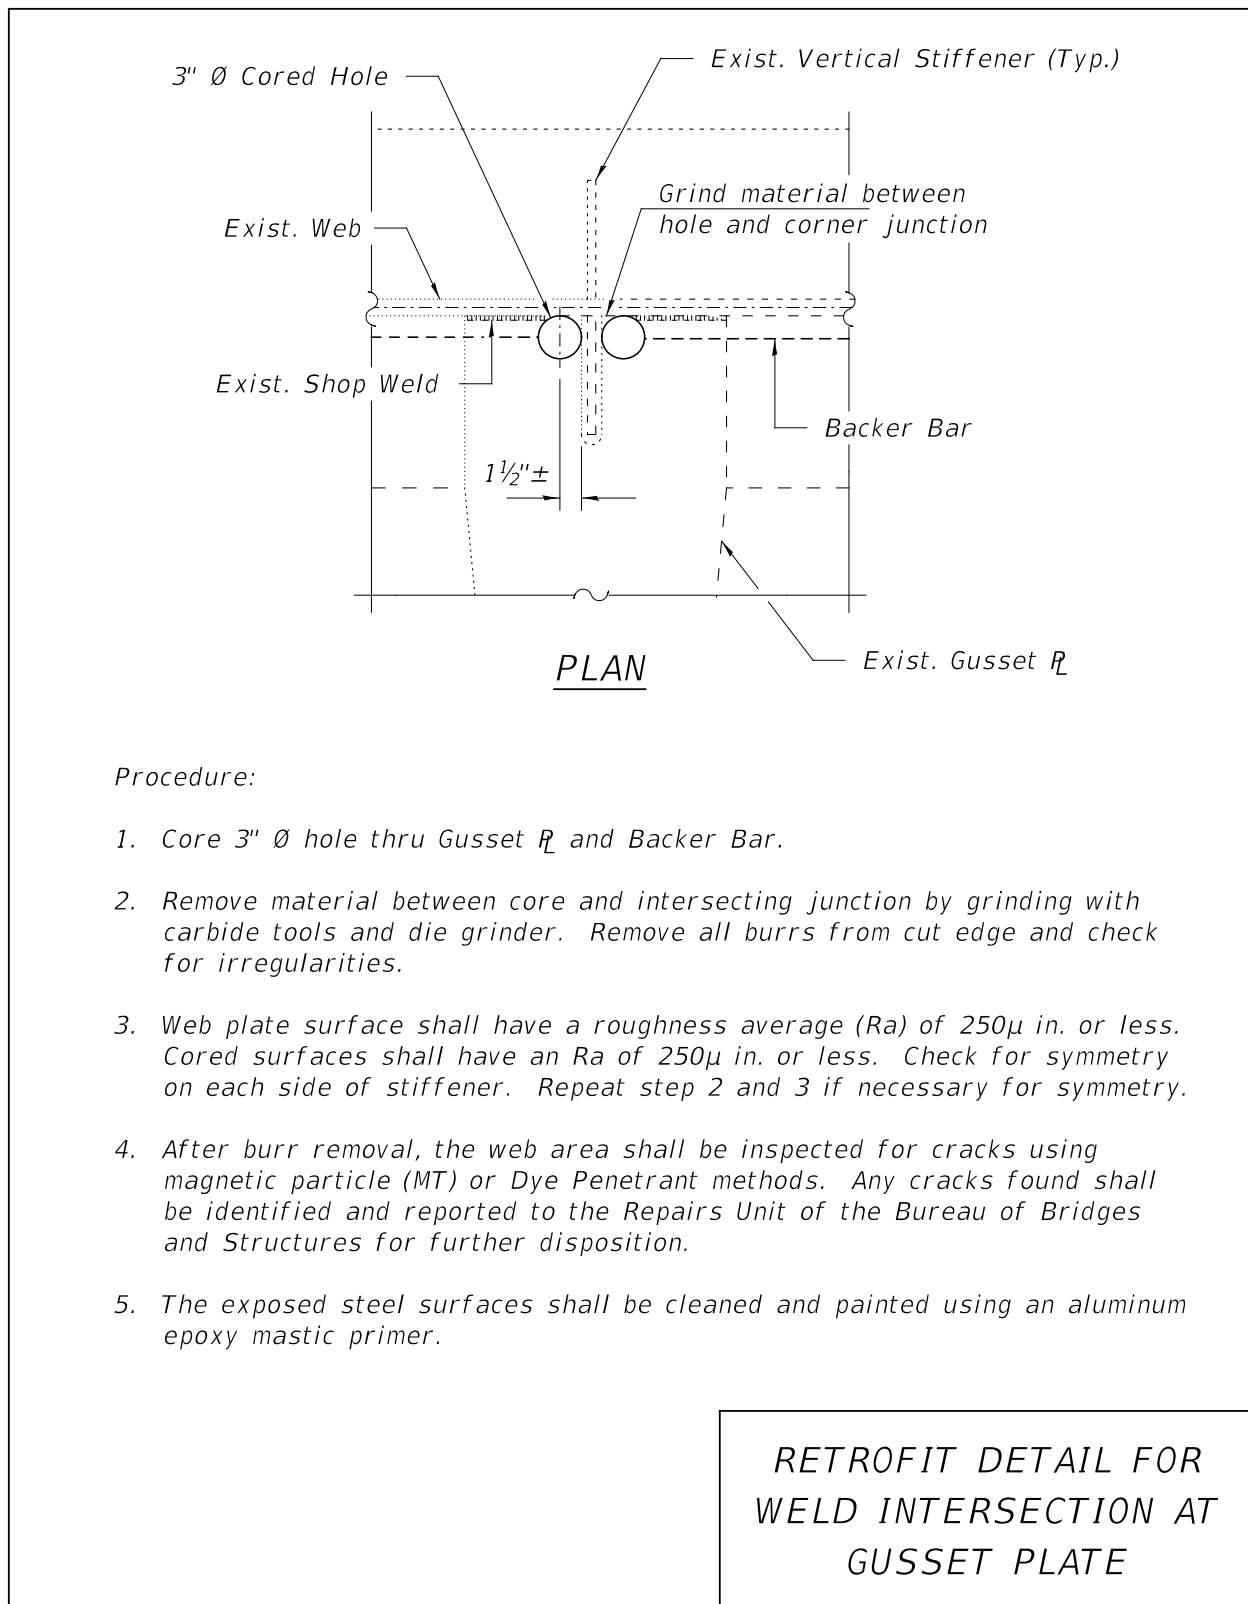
Retrofit Detail for Weld Intersection at Gusset Plate
